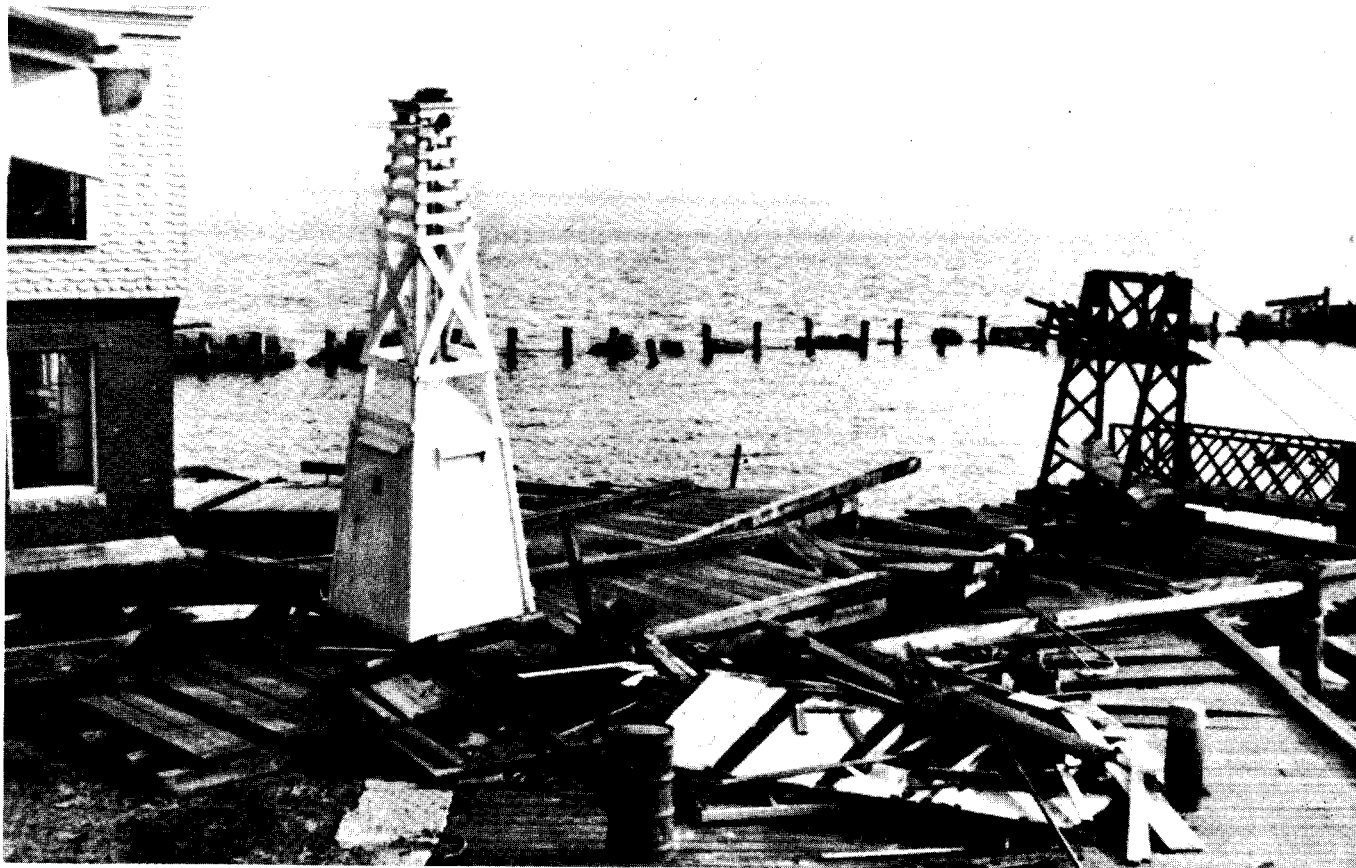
The morning after the hurricane of September 14, 1944. Corner of damaged laboratory building (left), range light (white towerlike structure) washed from its base on the stone jetty which was destroyed by waves (background); remnants of swinging bridge (right).
